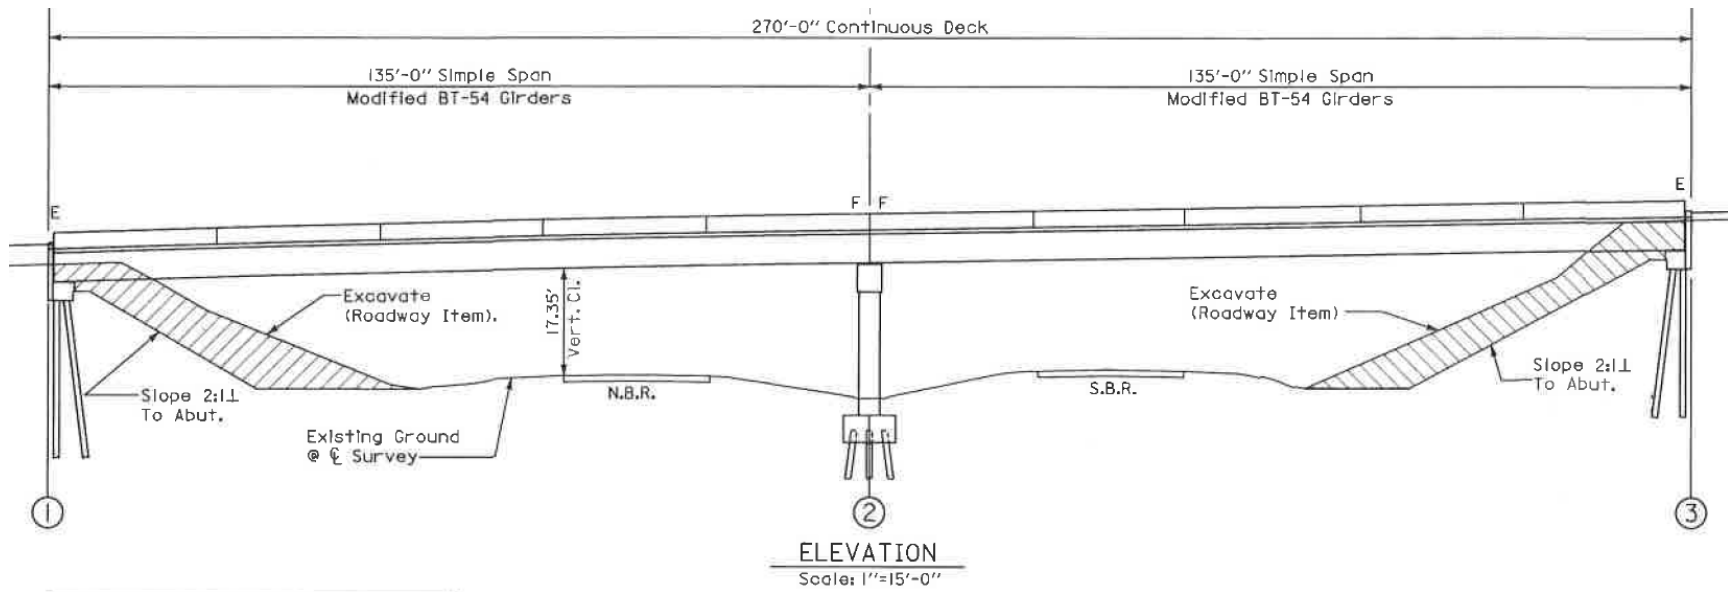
Lee County bridge elevation view (ALDOT 2006)
